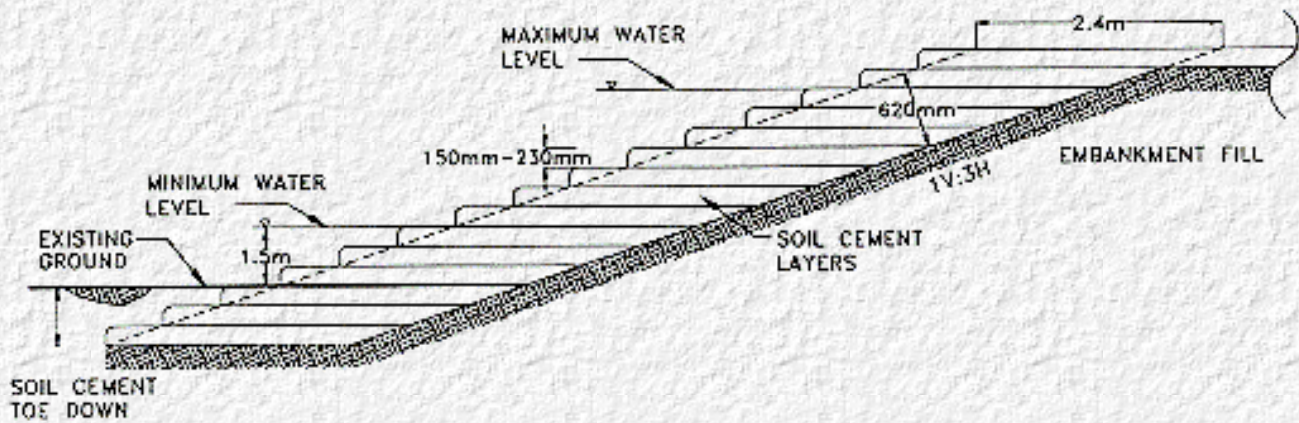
Typical Section for Soil Cement Slope Protection (Stair-step Method)
